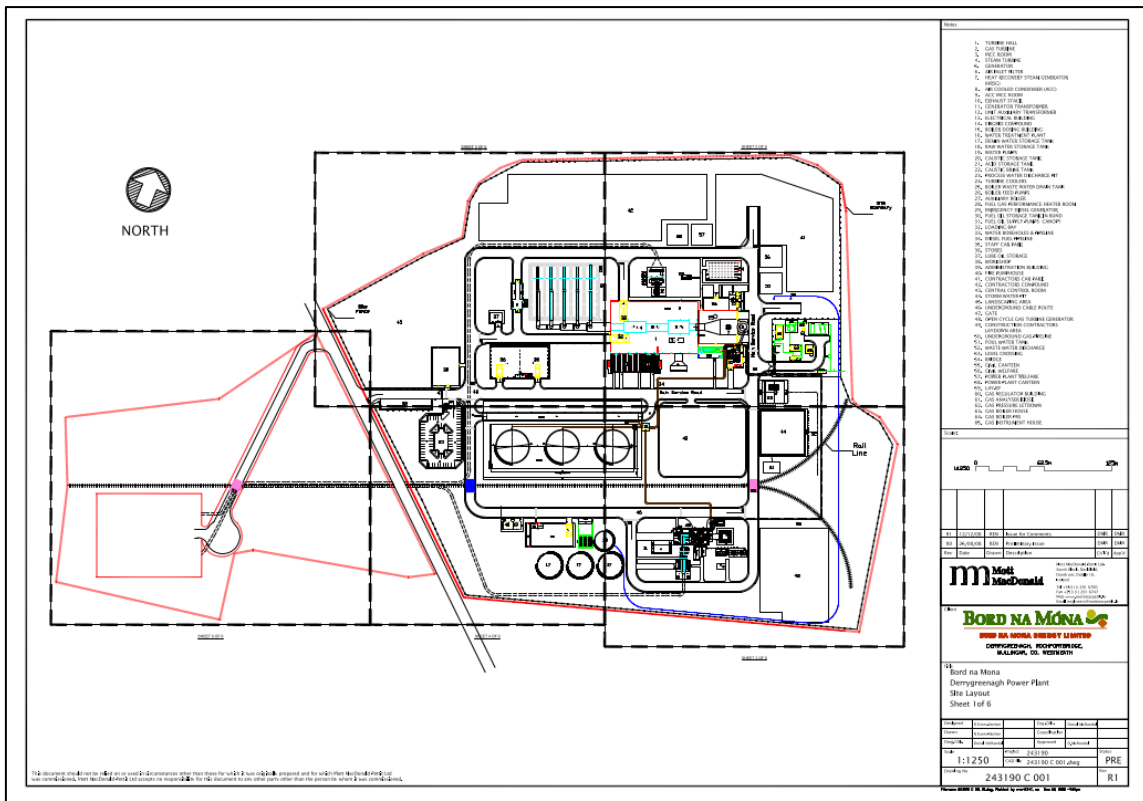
Power Plant Area Site Plan – Layout Option A
